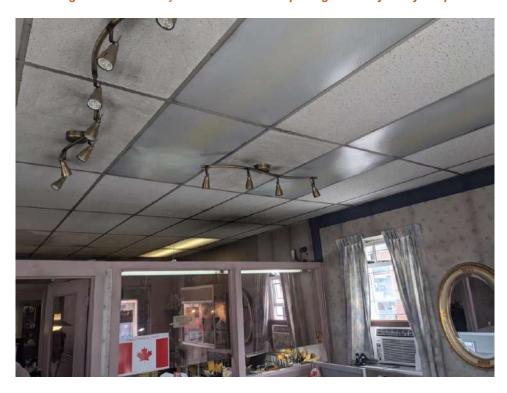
Drop tile ceiling and fluorescent lighting in the jewelry shop
